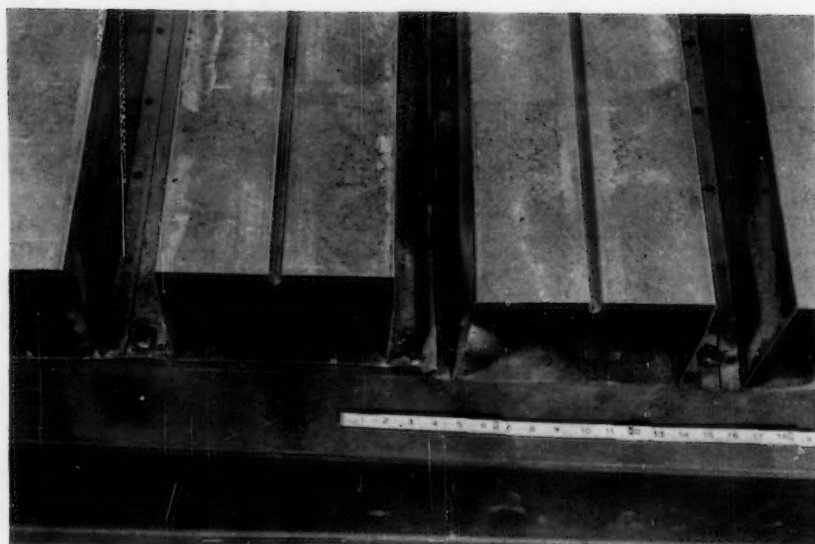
DETAIL OF PUDDLE-TYPE END WELDS AND SEAM WELDS
